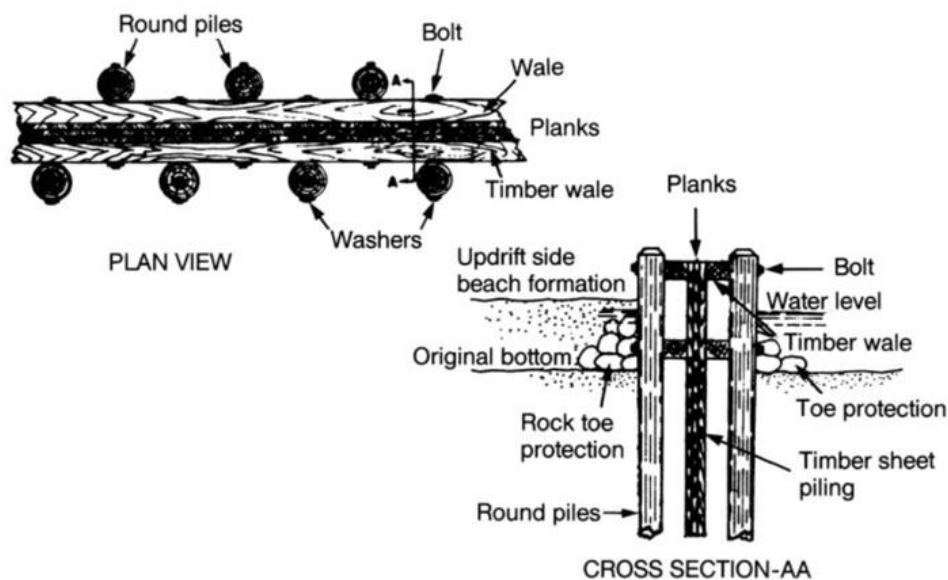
Plan view and cross section of wooden groyne . Reproduced from O'Neill Jr (2000).
